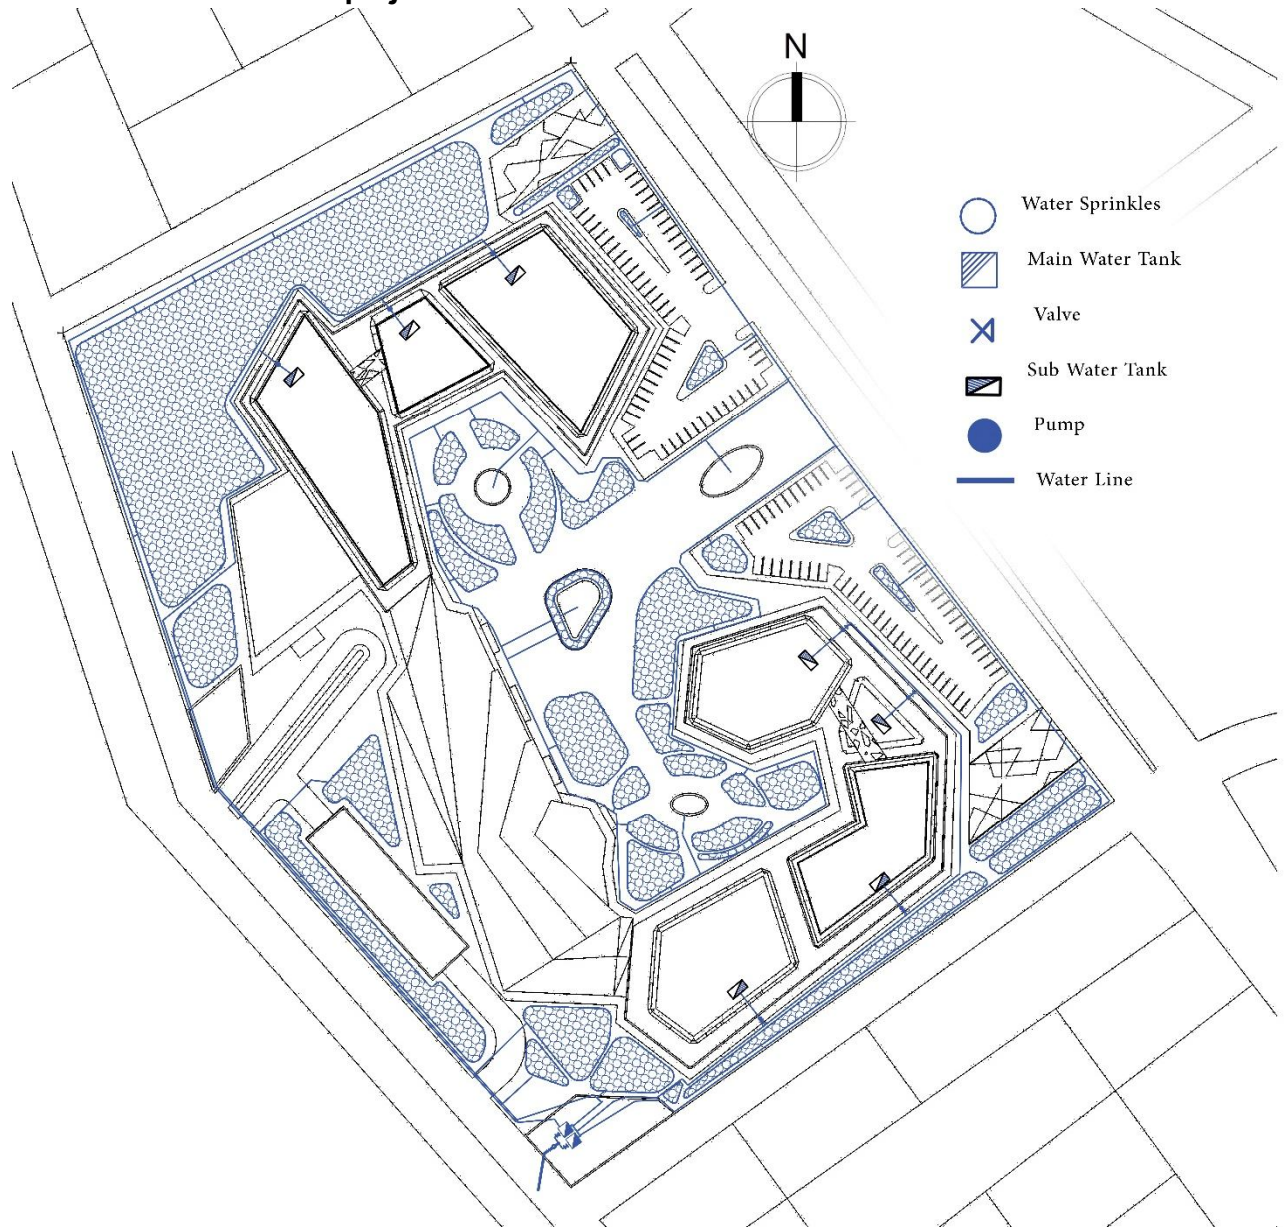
Site Plan showcasing how the water is supplied to the building and to the landscape.
